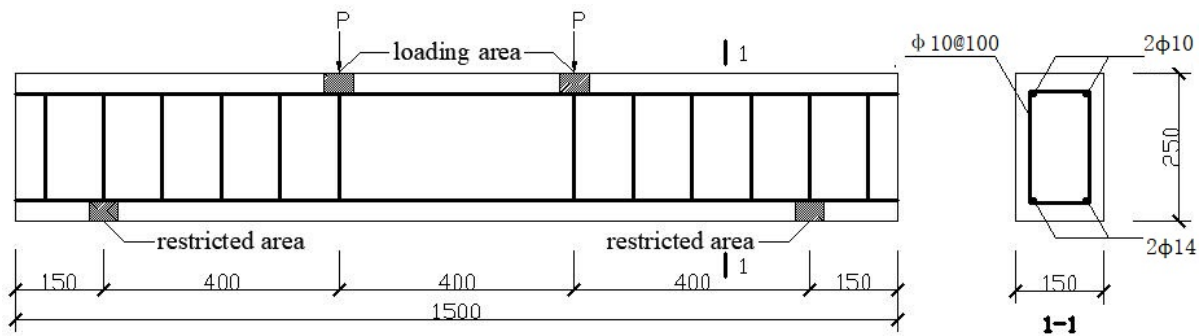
Structural drawing of beam specimen of the second group (unit: mm)
